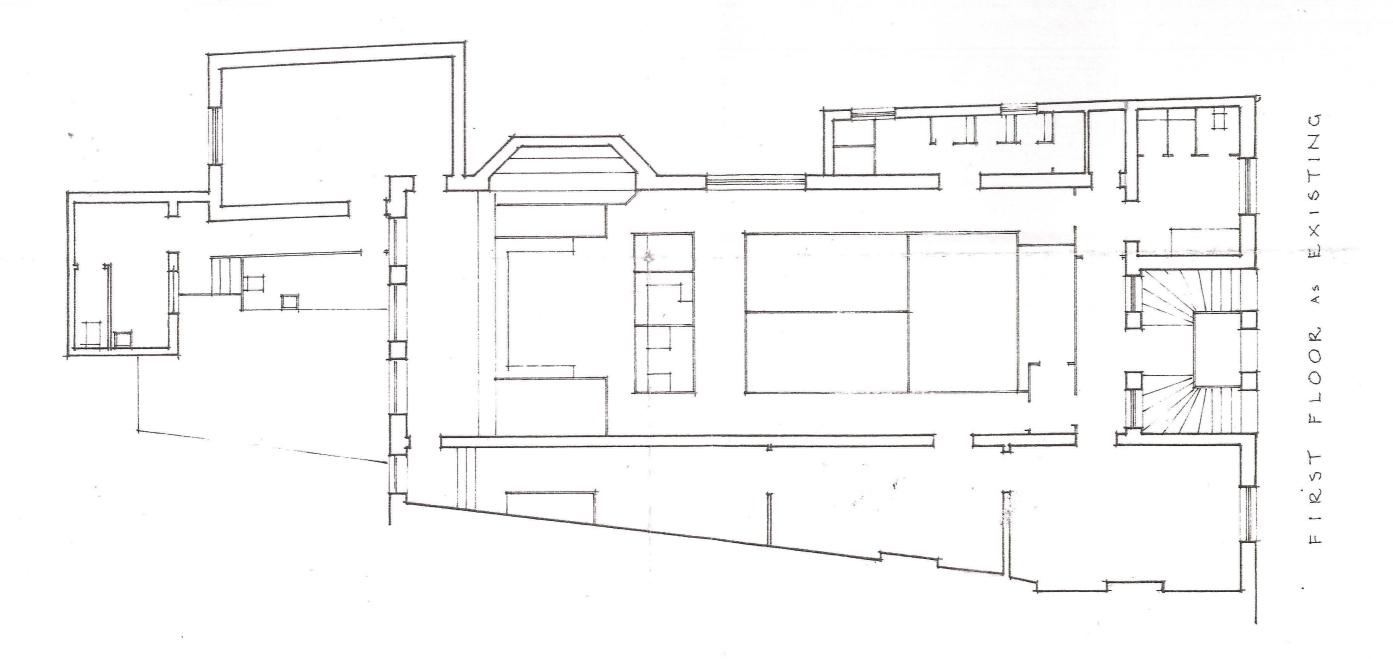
Bourne Sessions House First floor plan showing layout as existed in 1958 (JWH Barnes County Architect, County Offices, Sleaford). Plan supplied by the client. Scale 1"=8' (1:96)
